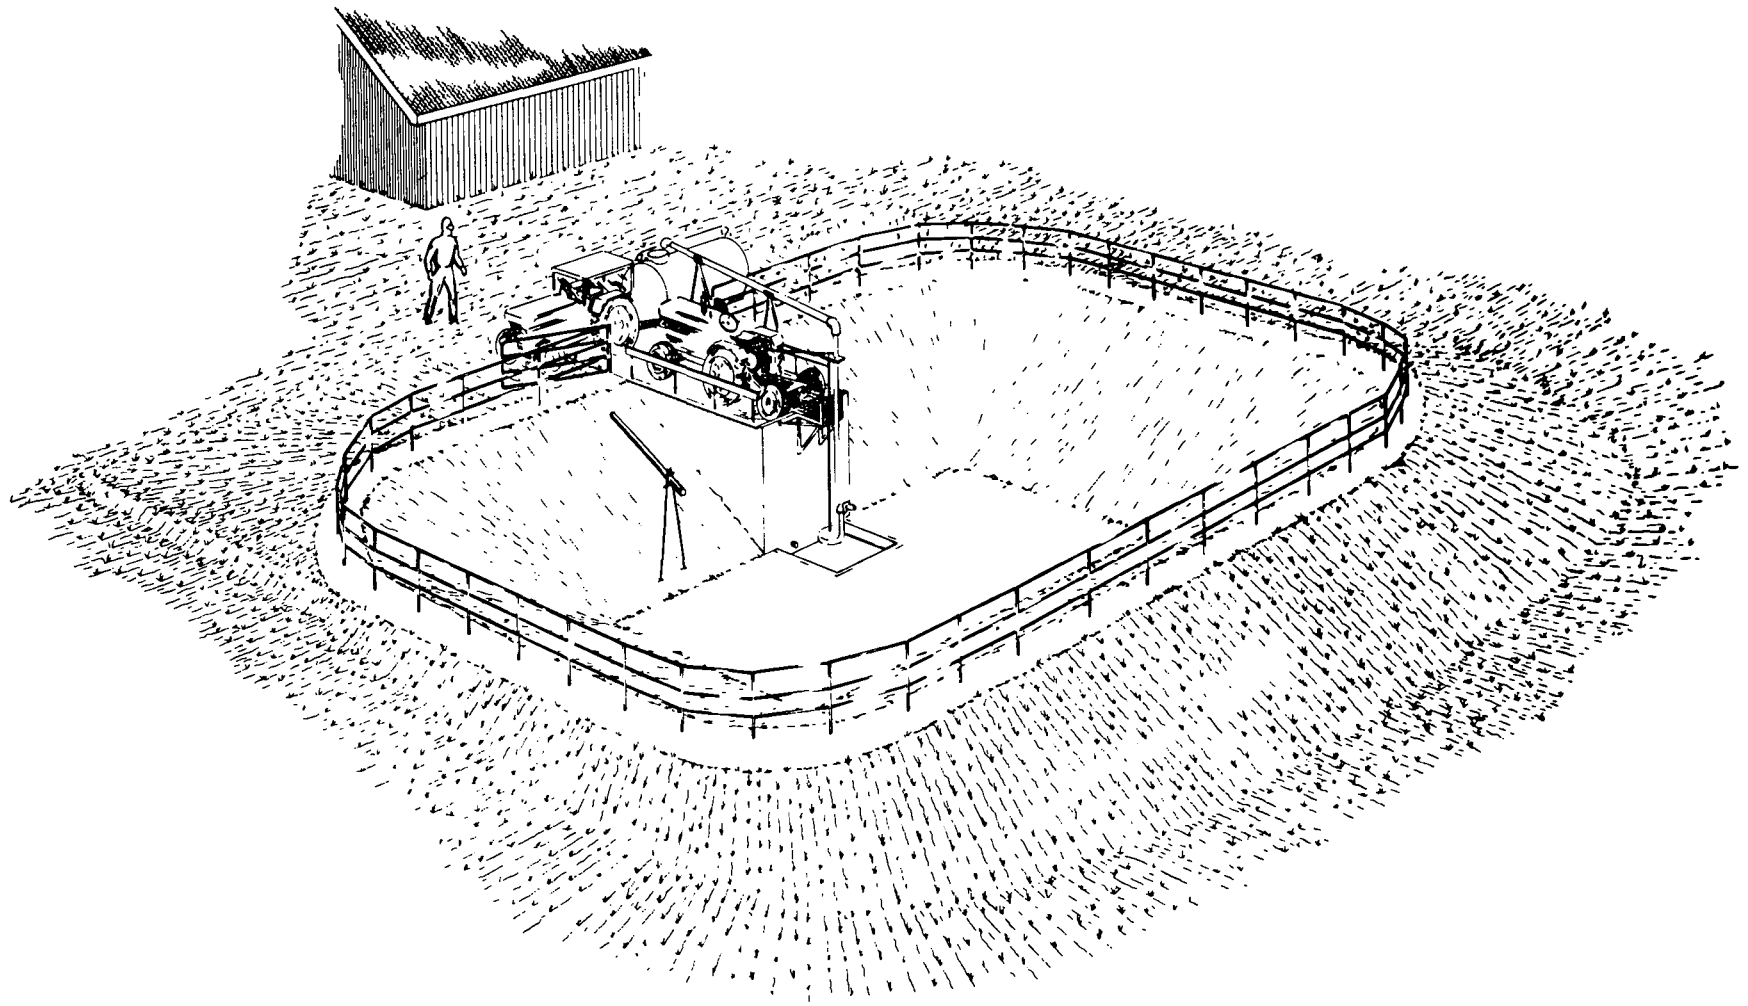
Clay-lined Manure Storage Pond with Pumping Dock (CPS Plan 2371)
